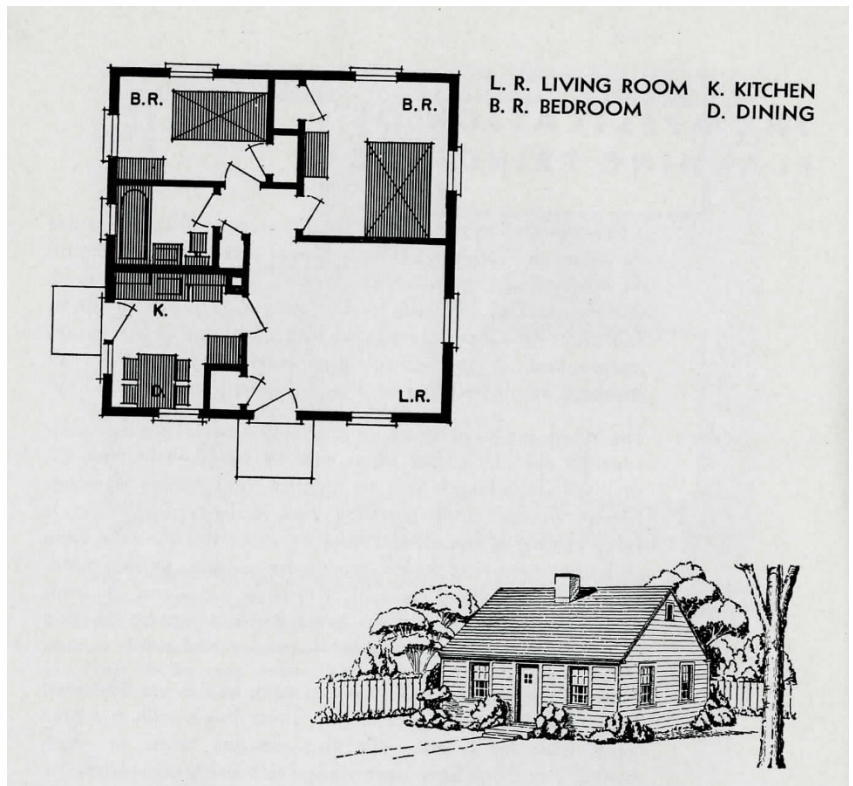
Basic plan, one story, two-bedroom minimum house from FHA's "Principles of Planning Small Houses," 1940.
